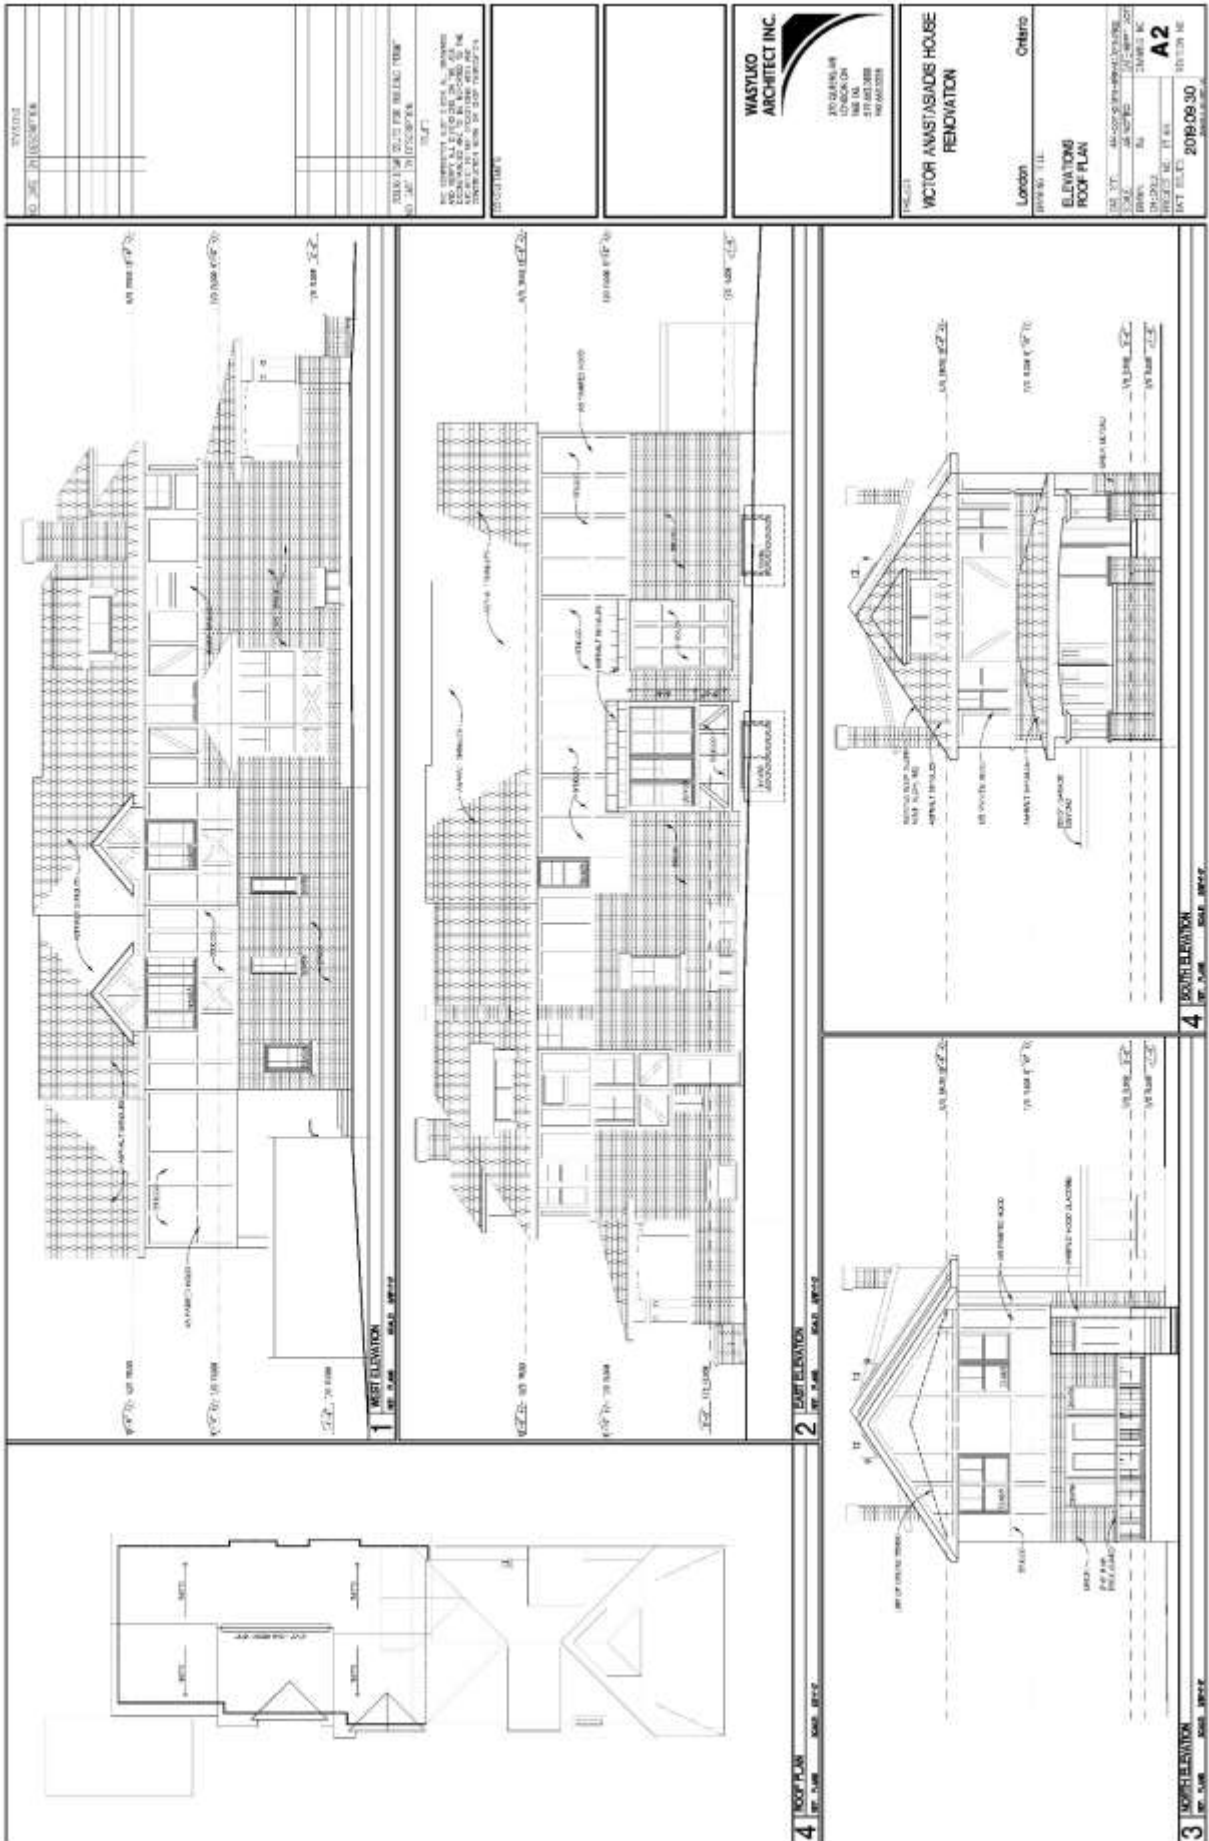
Architectural plans, submitted as part of the Heritage Alteration Permit application, showing the proposed half timbering detail for the existing building at 562 Dufferin Avenue.
